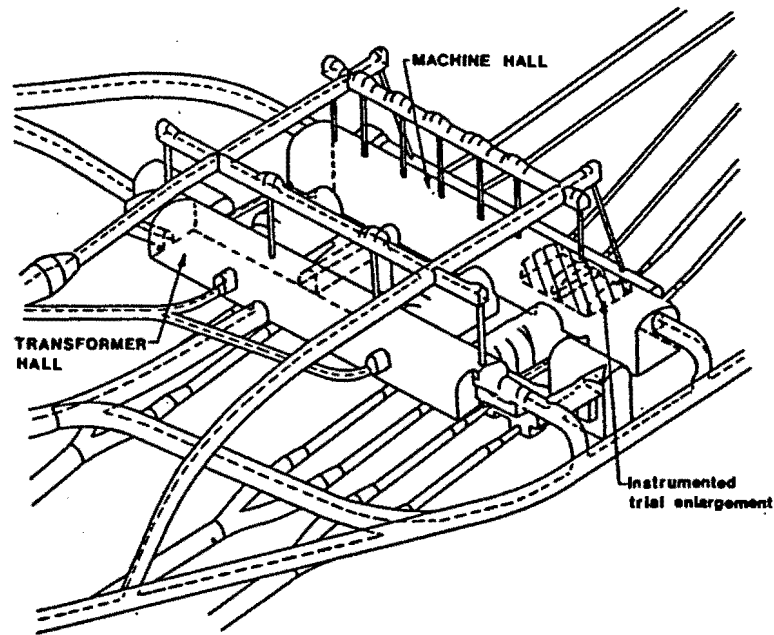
Layout of underground caverns at Dinorwig Power Station (Douglas et al., 1984)
